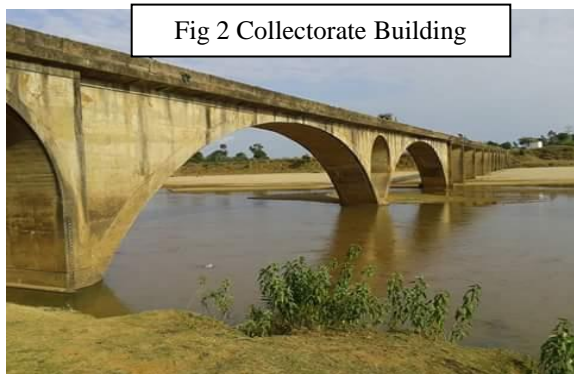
Bishrampur Surajpur Bridge over River Rehan
